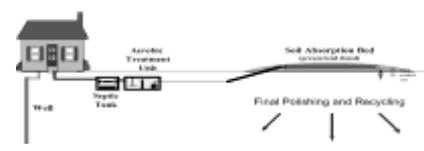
depict typical drainfield layouts that are currently used in Wisconsin. Figure 5 & 6 depict advance pretreatment systems.
